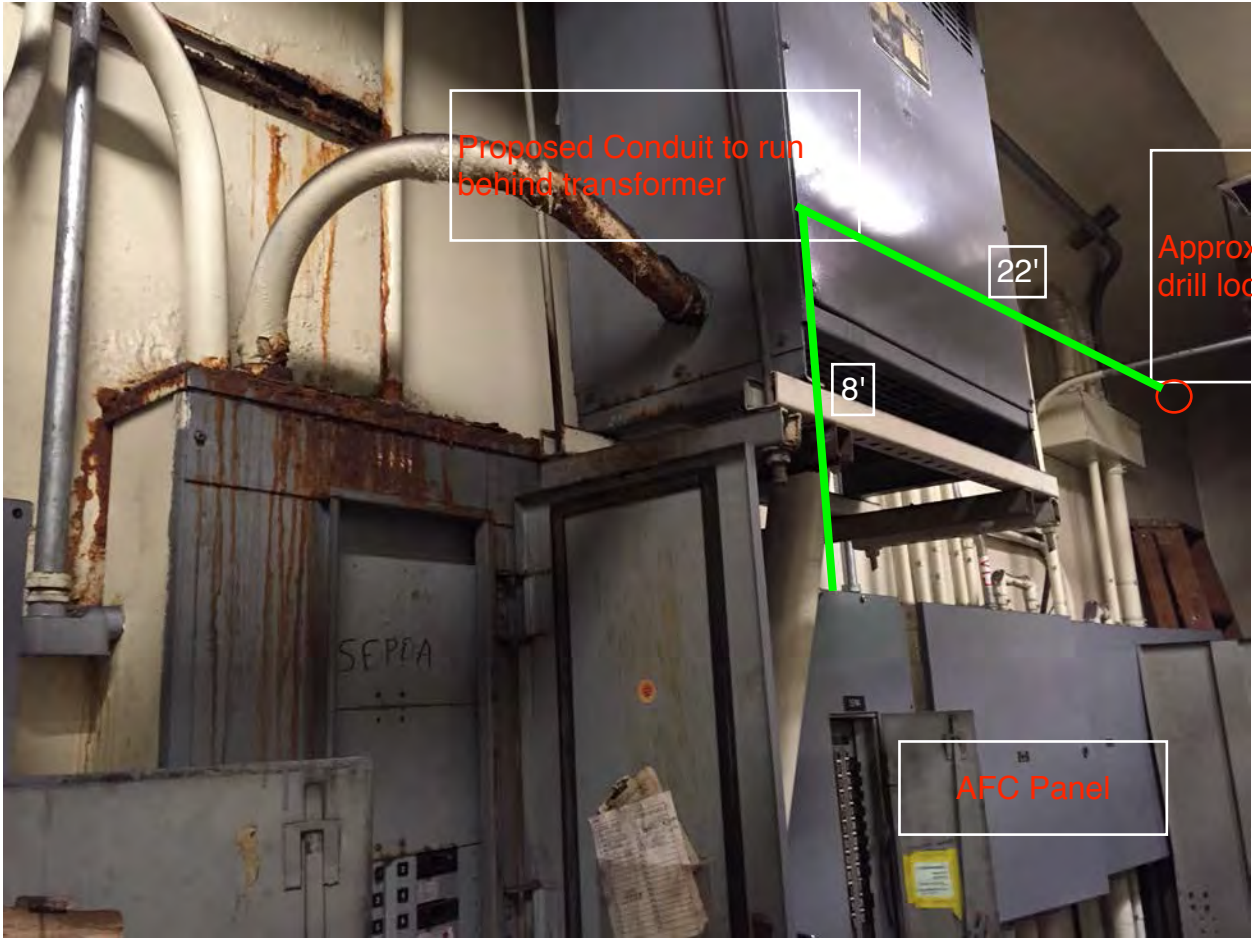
Existing Duct and Proposed Conduit feeding AFC panel SEMA in room 201
